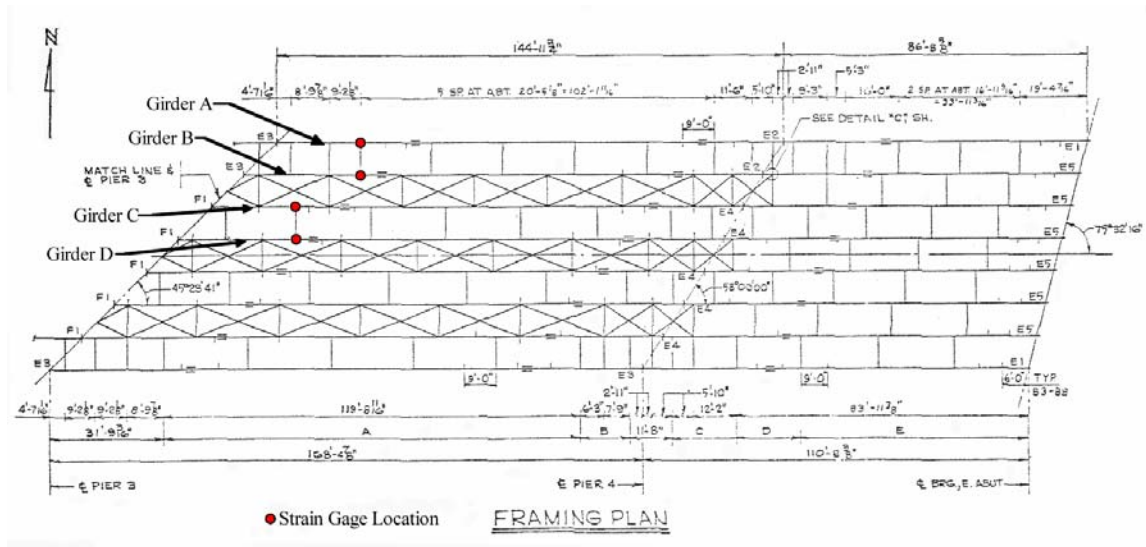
Plymouth Avenue Bridge Strain Gage Locations
